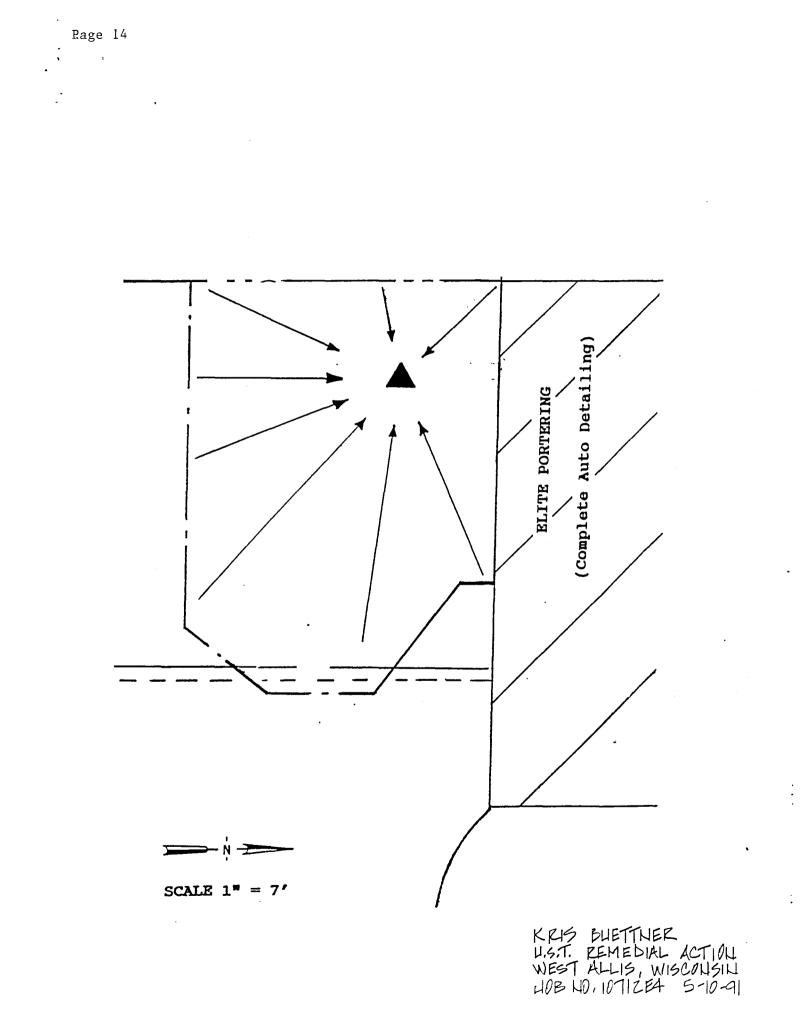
RECOVERY SUMP INSTALLATION (WEST EXCAVATION)
